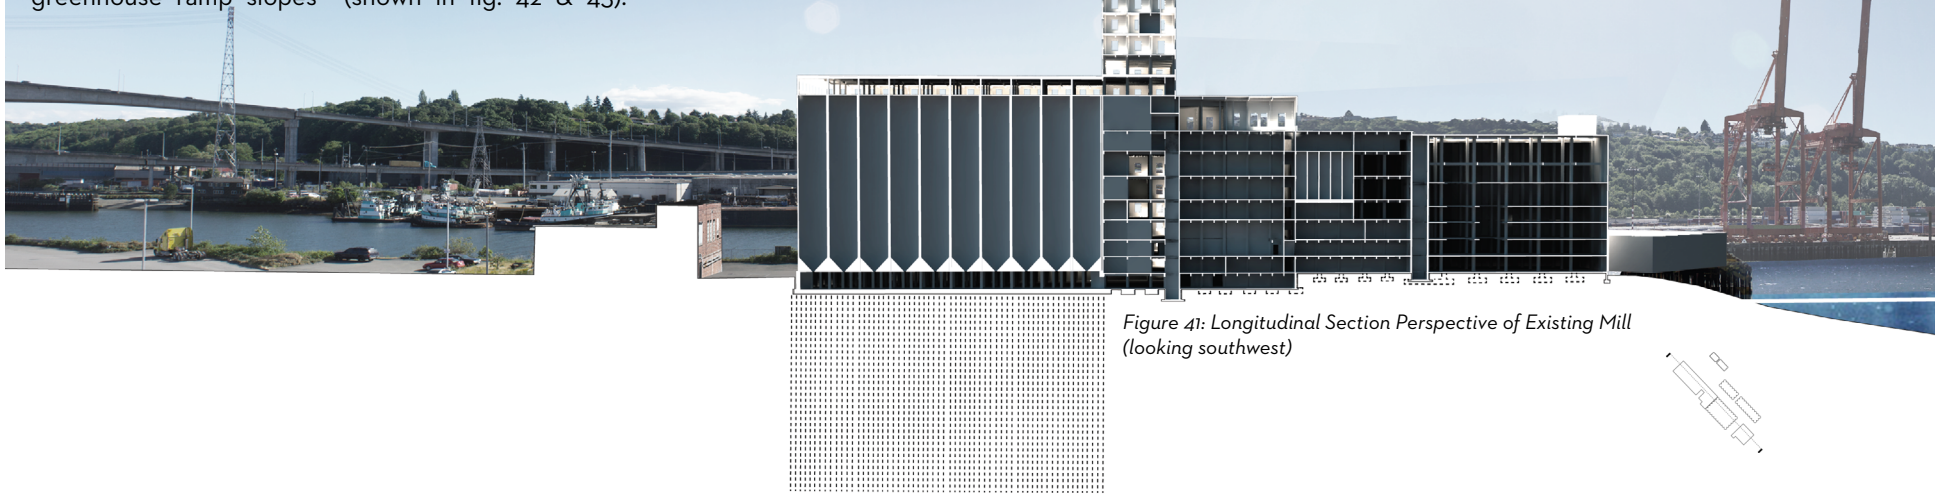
Longitudinal Section Perspective of Existing Mill (looking southwest)
